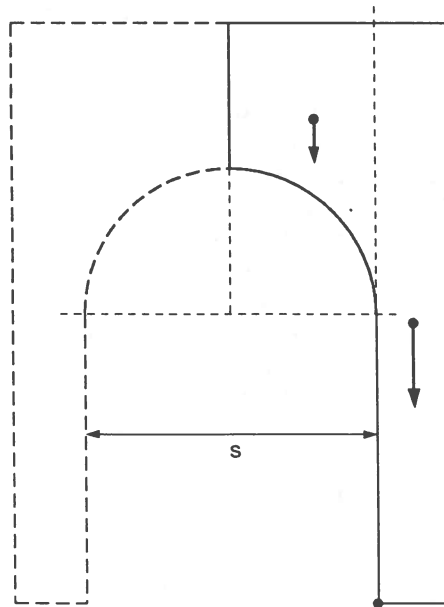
Wren's design procedure for masonry arch and abutment: the greater the superimposed load, the wider the abutment must be. Equilibrium about the inner edge of the abutment is considered.
